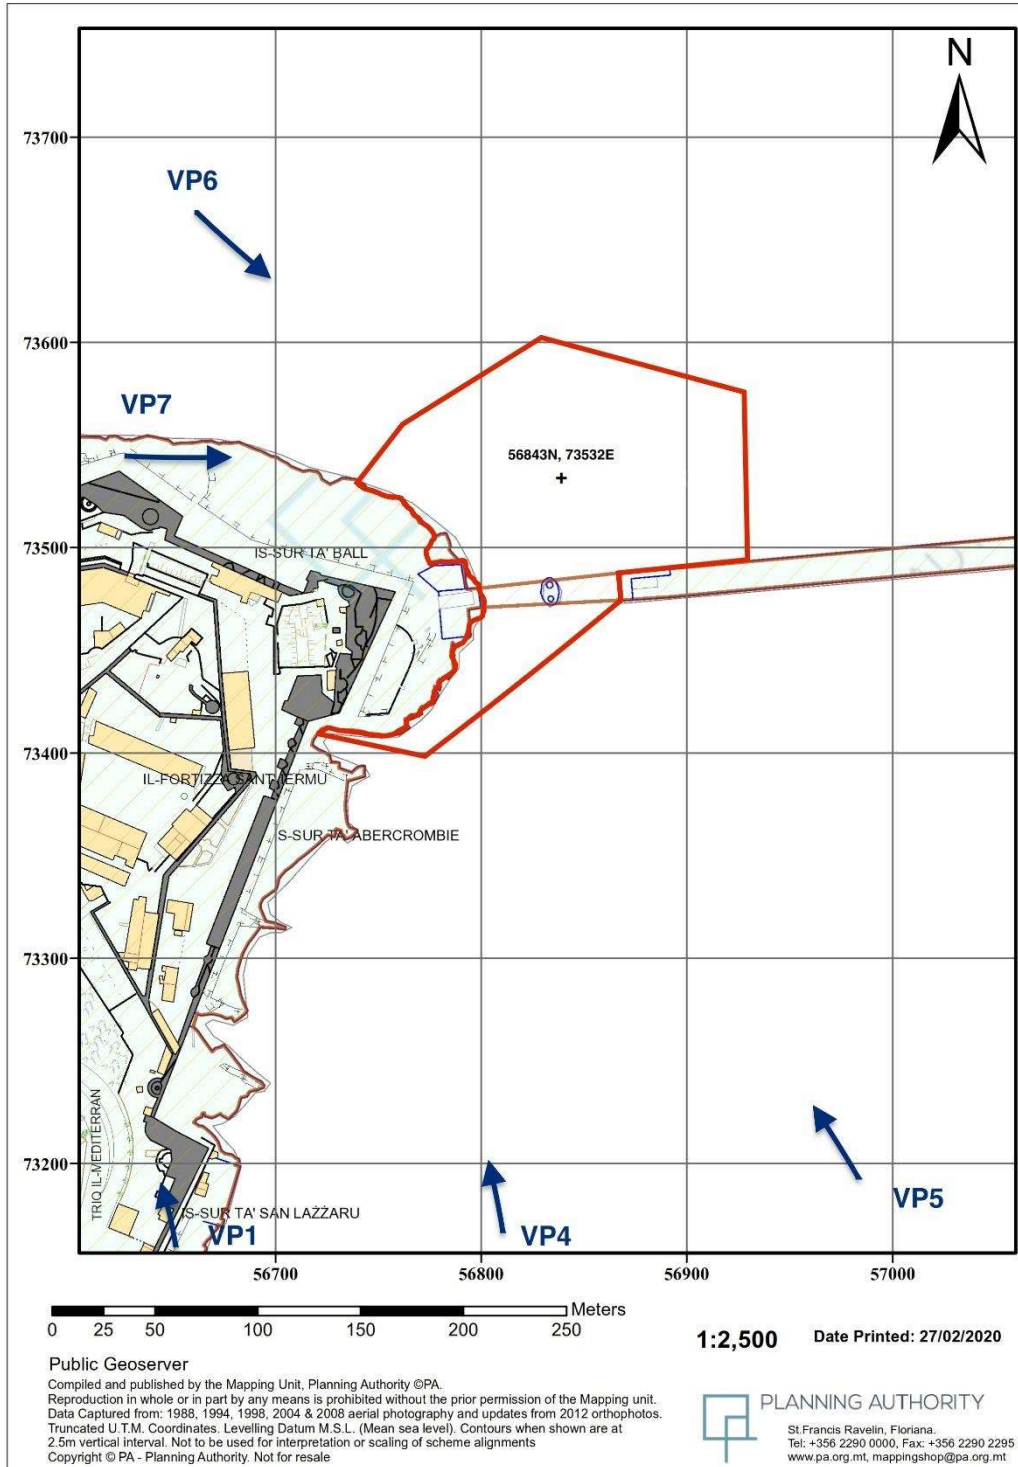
St Elmo North Breakwater Site Plan above Mean Sea Level
